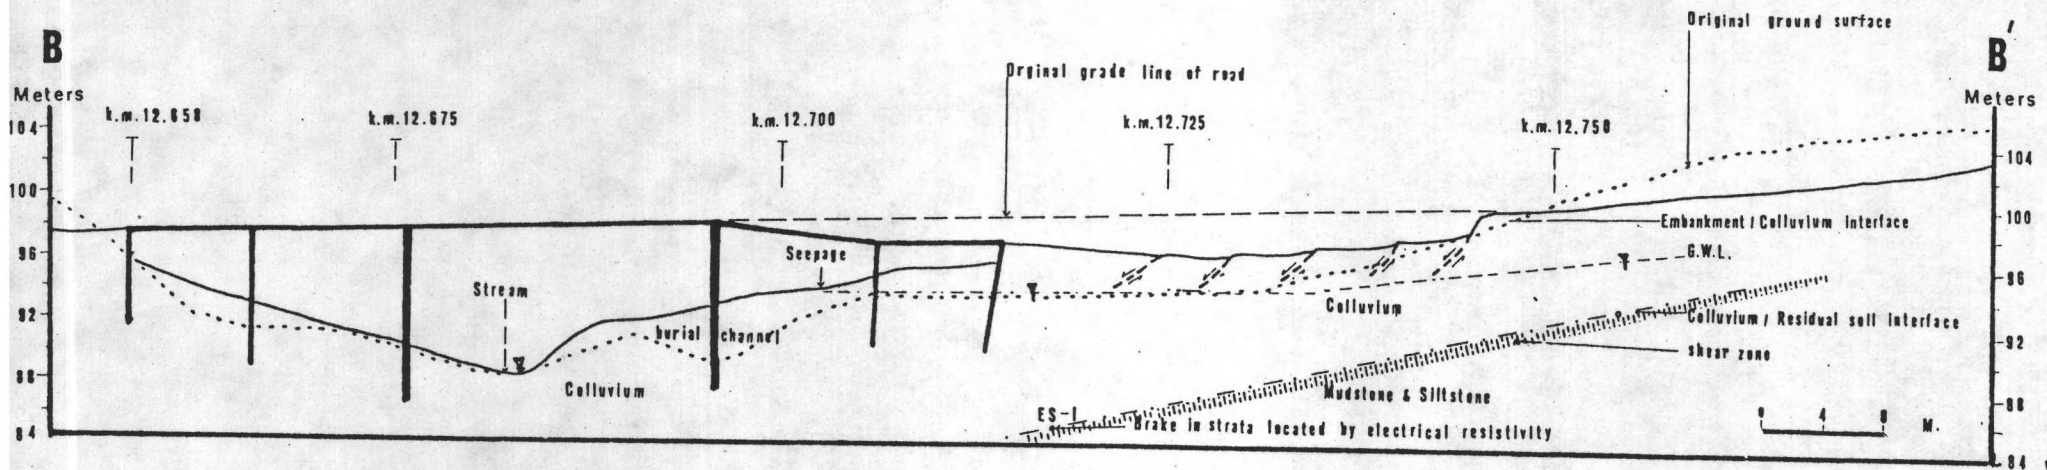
A cross-section parallel to the road centerline, showing the damage bridge and bridge approached abutment for failure in 1983.
